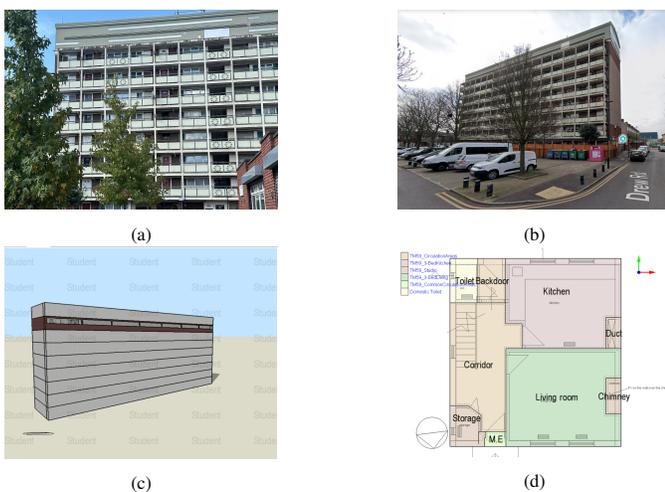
(a,b) a picture of the case study house. (c) the 3D model of the case study house. (d) flat floor plan from Designbuilder.
